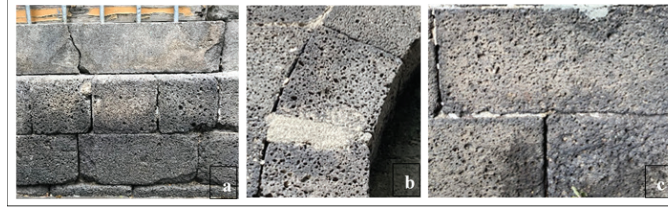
Mortar Erosion a. South Façade Wall b. South Façade Arch c. South Façade Wall
